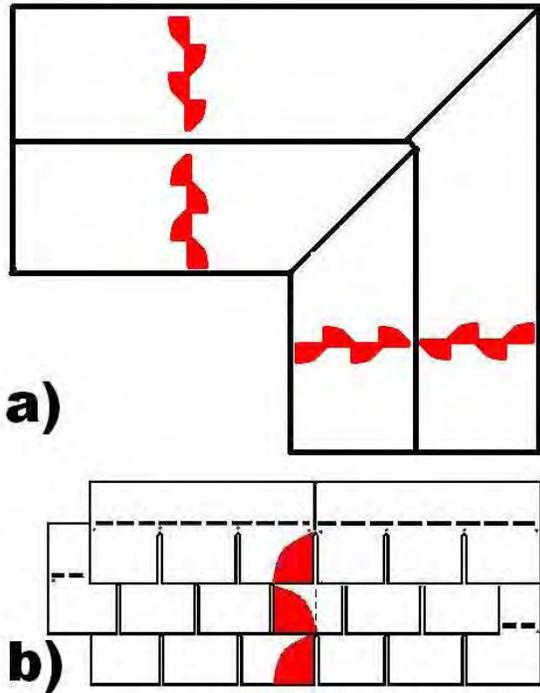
Straight-up pattern of shingle overlaps that are not bonded to the roof: a) roof plan showing alternating overlaps not bonded to the roof on each directional slope, and b) idealized diagram showing red shaded region where tabs were not bonded to the underlying shingles. This pattern extends vertically upslope in the manner in which these shingles were installed.
